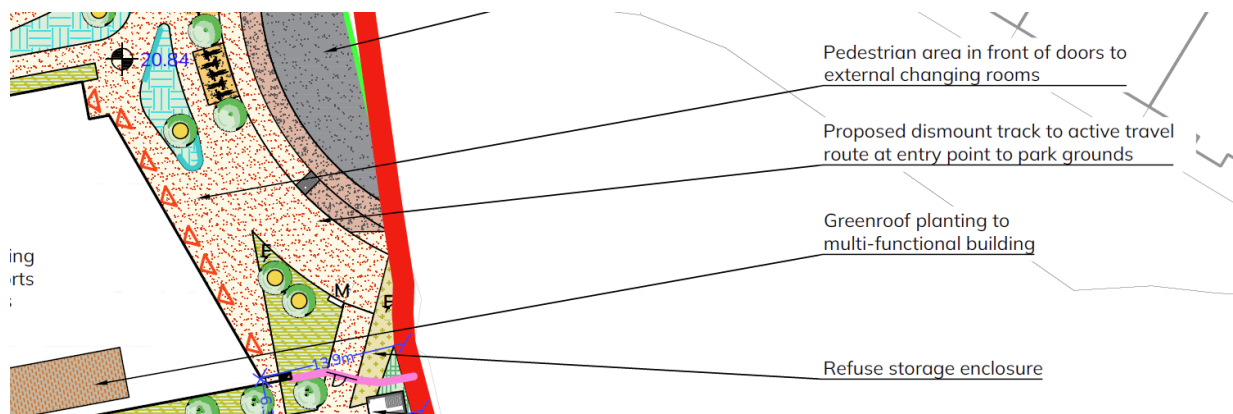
Meet and Gather Spot detail from proposed Site Layout Plan of Kingston Park (Drawing P612-KIN-LD-GA-101)
